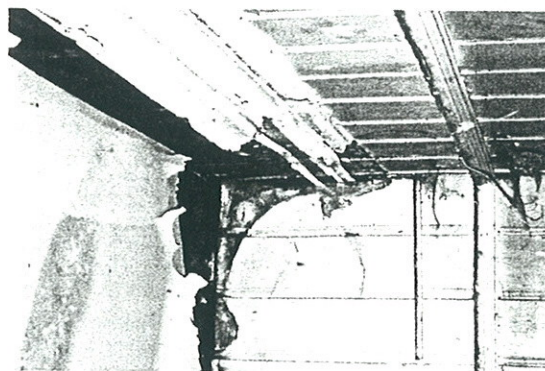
The reverse of the wall shown on the right of the previous plate is lathed and plastered above the ceiling line, a vestige of the days when it extended to floor level. The truss, purlin and roofboards are all limewashed.
